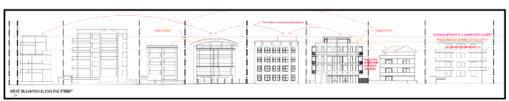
Streetscape elevation of Victoria Parade within the urban block
